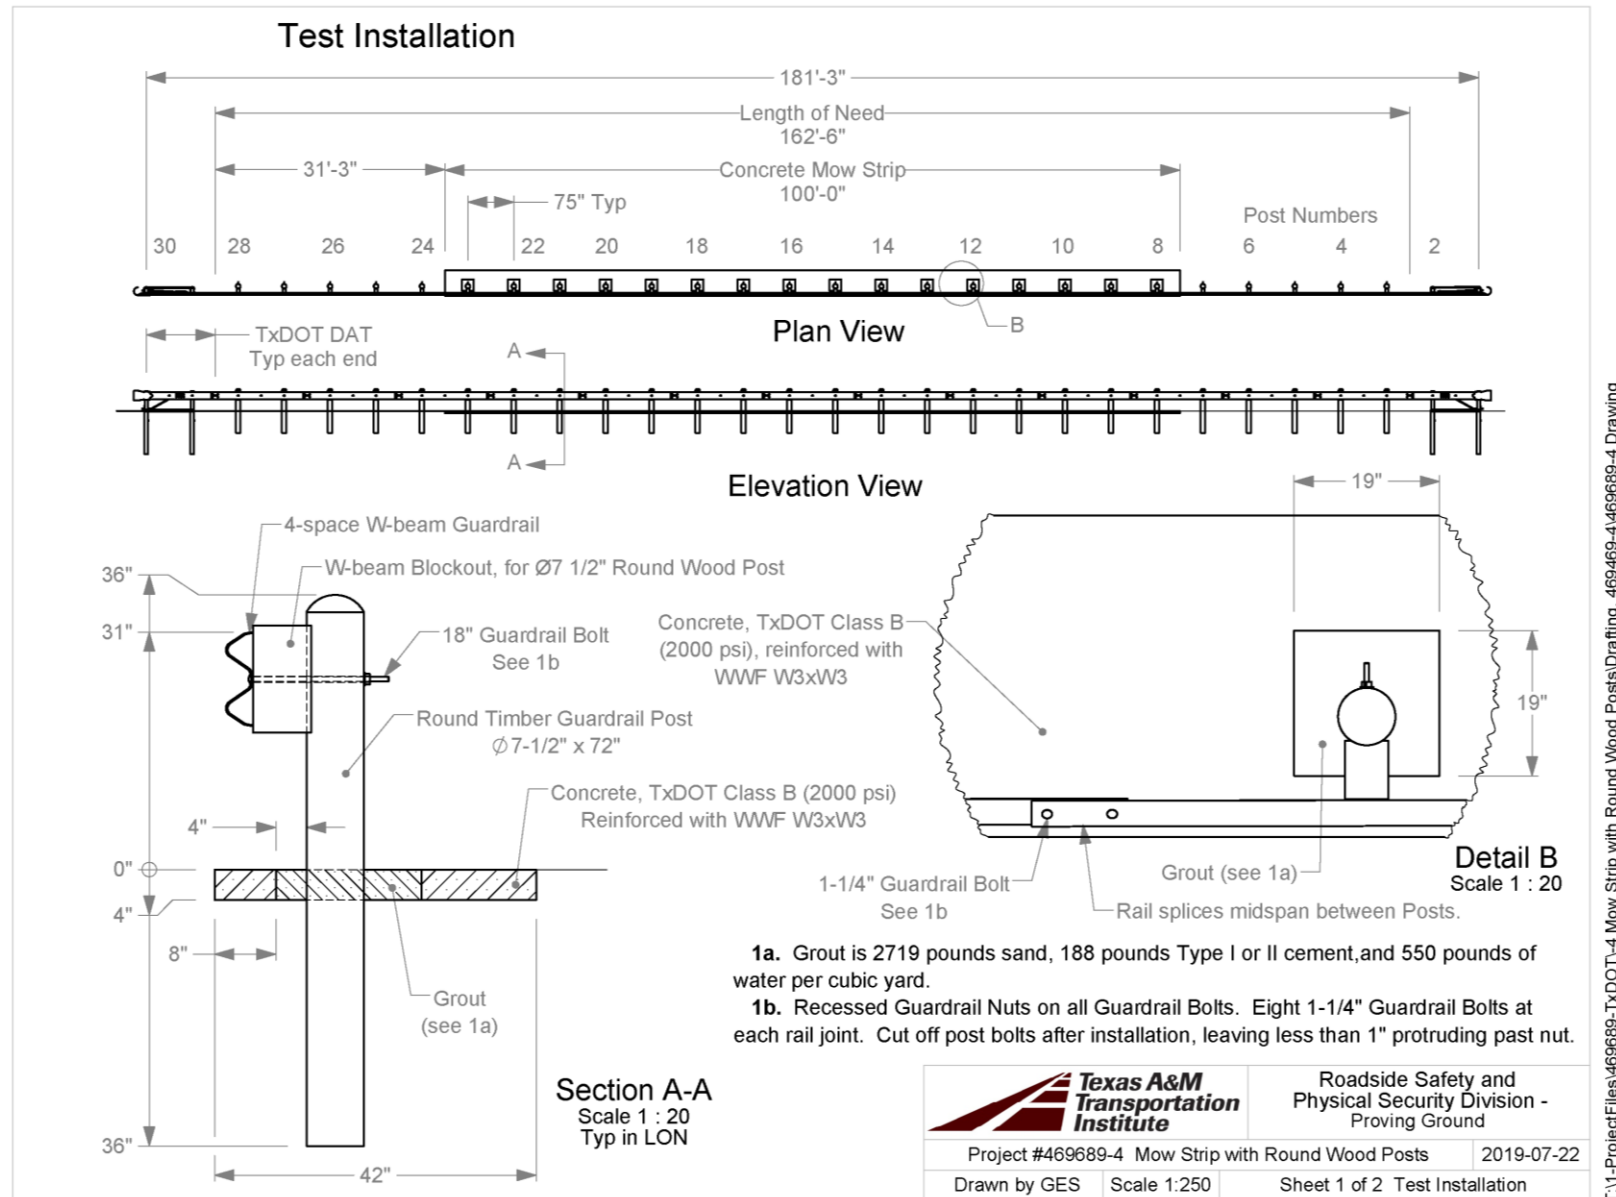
Overall Details of TxDOT W-Beam Guardrail with 7½-Inch Diameter Round Wood Posts in Concrete Mow Strip.
